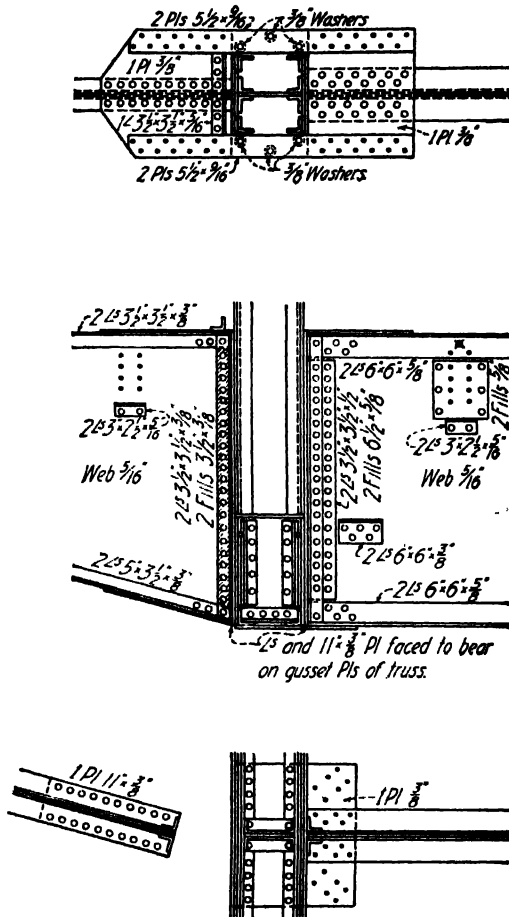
Strap Plates and Thrust Angles for Cantilever Beams of Truss Spans.
